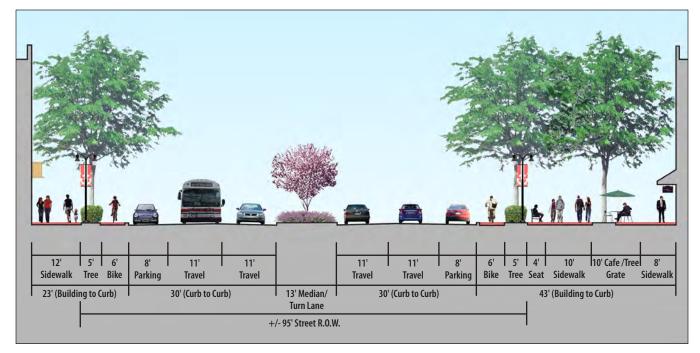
PROPOSED STREET SECTION—RHODE ISLAND AVENUE, WEST OF THE TRAFFIC CIRCLE, LOOKING WEST.
